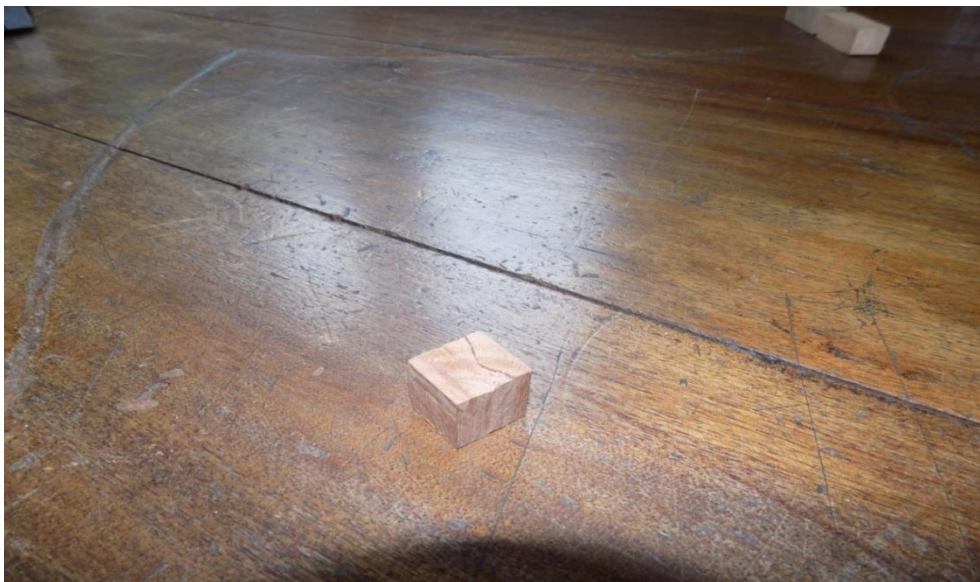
View of the specimen after testing showing true shearing mode of failure.
